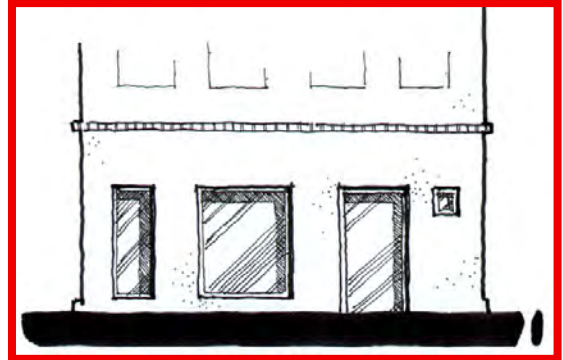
Street frontages shall be occupied by building facades for at least 60% of the lot width on the buildings primary street. Corner buildings may reduce this to as much as 50% on the buildings secondary street provided the cumulative total for both streets exceed 60%.
